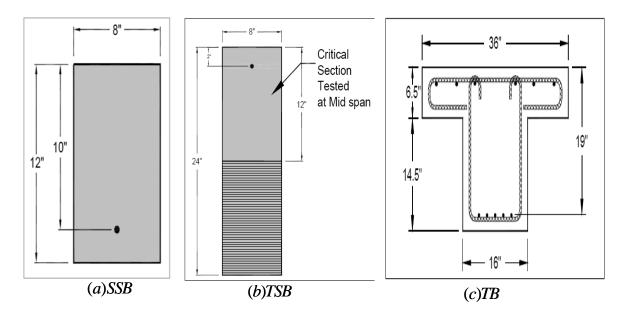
Cross-section of three specimen types (Larson et al. 2007).
